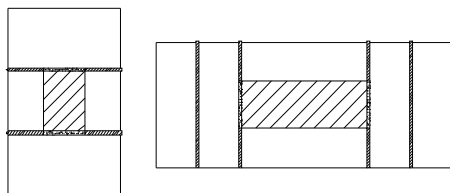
Vertical plane section: position of the cavity (left); Horizontal plane section intercepting the cavity (right).
